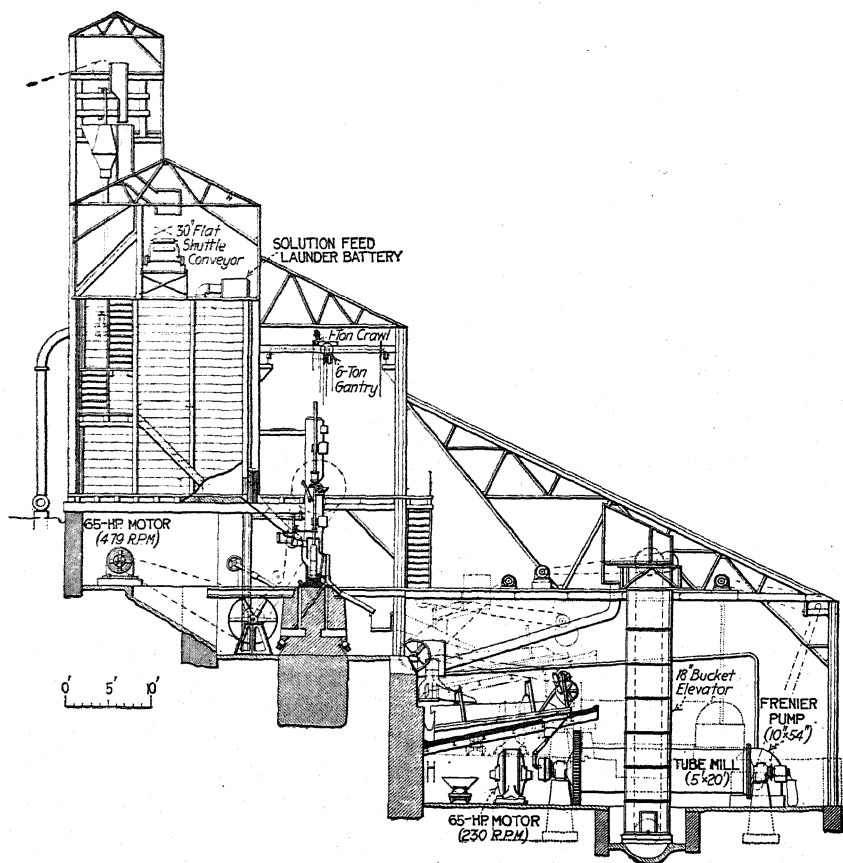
STAMP MILL. SECTIONAL VIEW.
